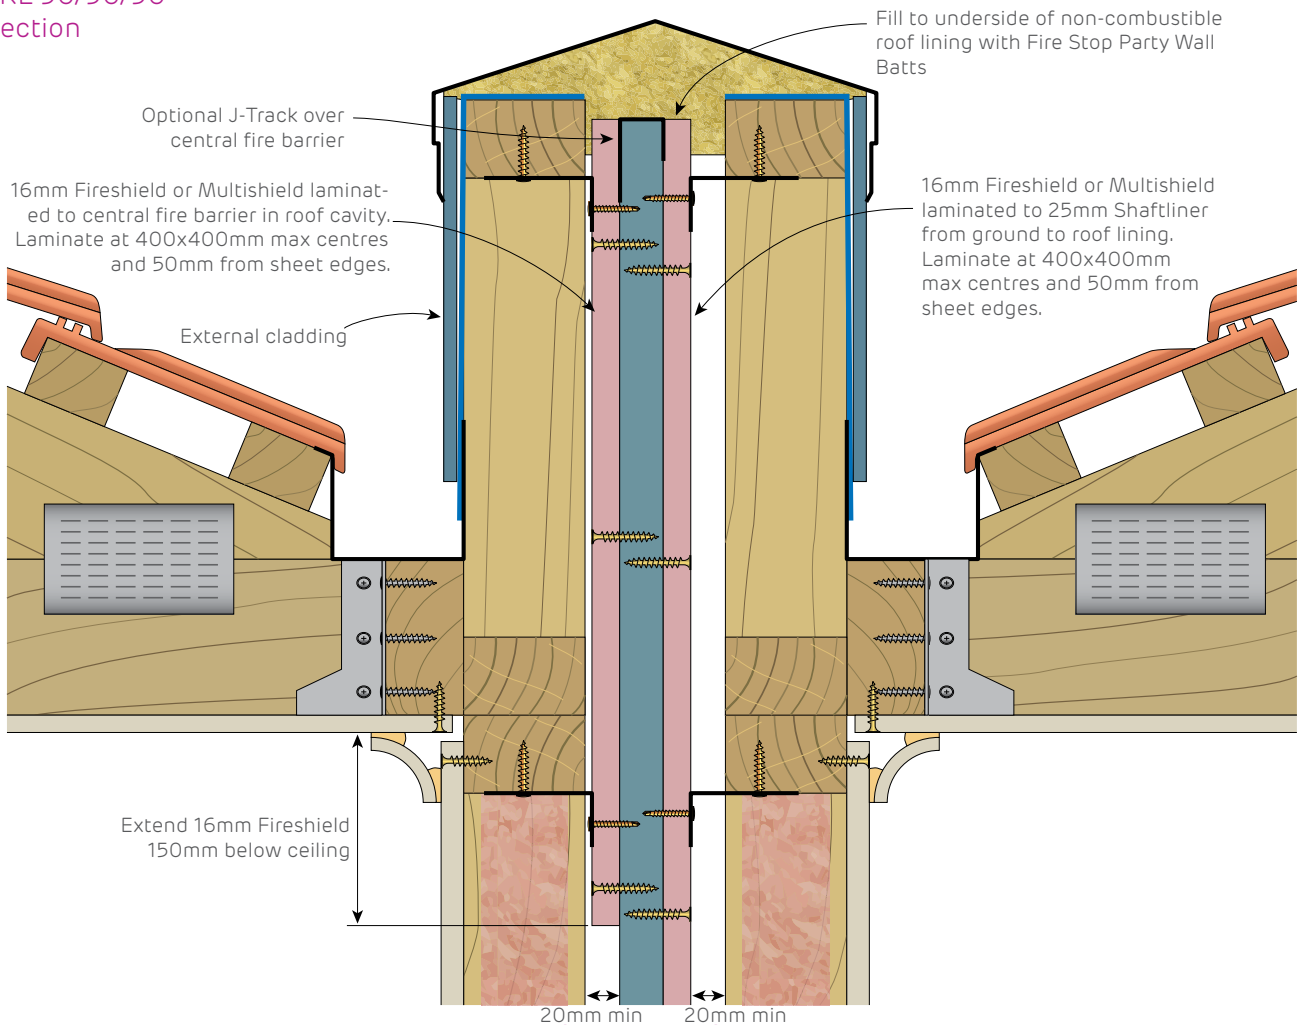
Interhome Wall to Parapet Roof with Perpendicular Roof Trusses
